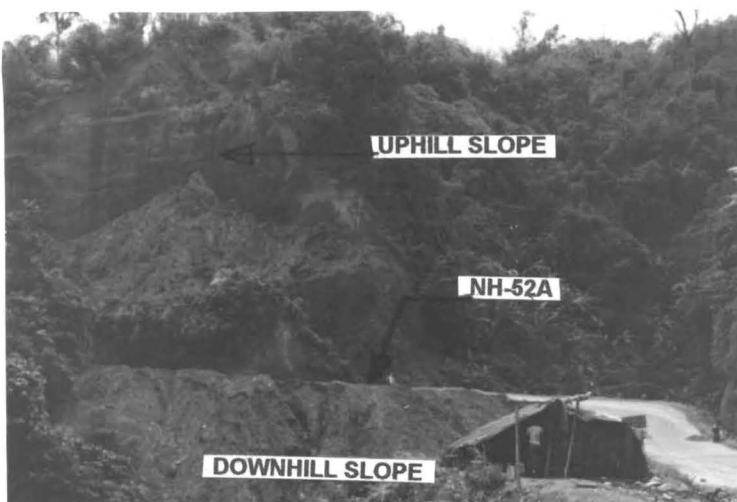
Photo showing landslide on uphill slope (NH-52A)
